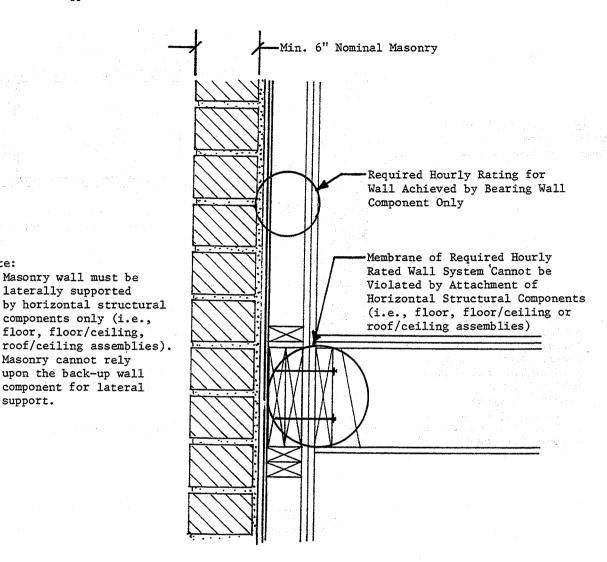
A Combination Masonry/Frame Wall (Bearing and Non-Bearing Condition)
